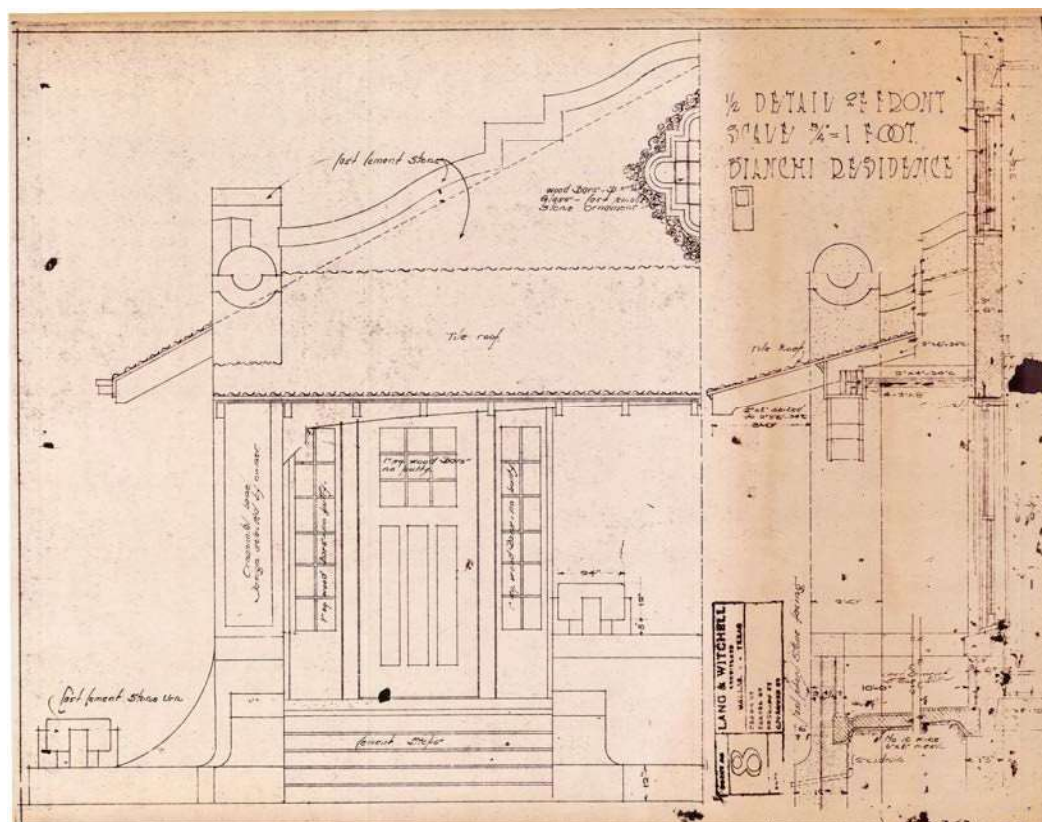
Original Lang and Witchell Front Porch Detail Sheet—Sheet 8
